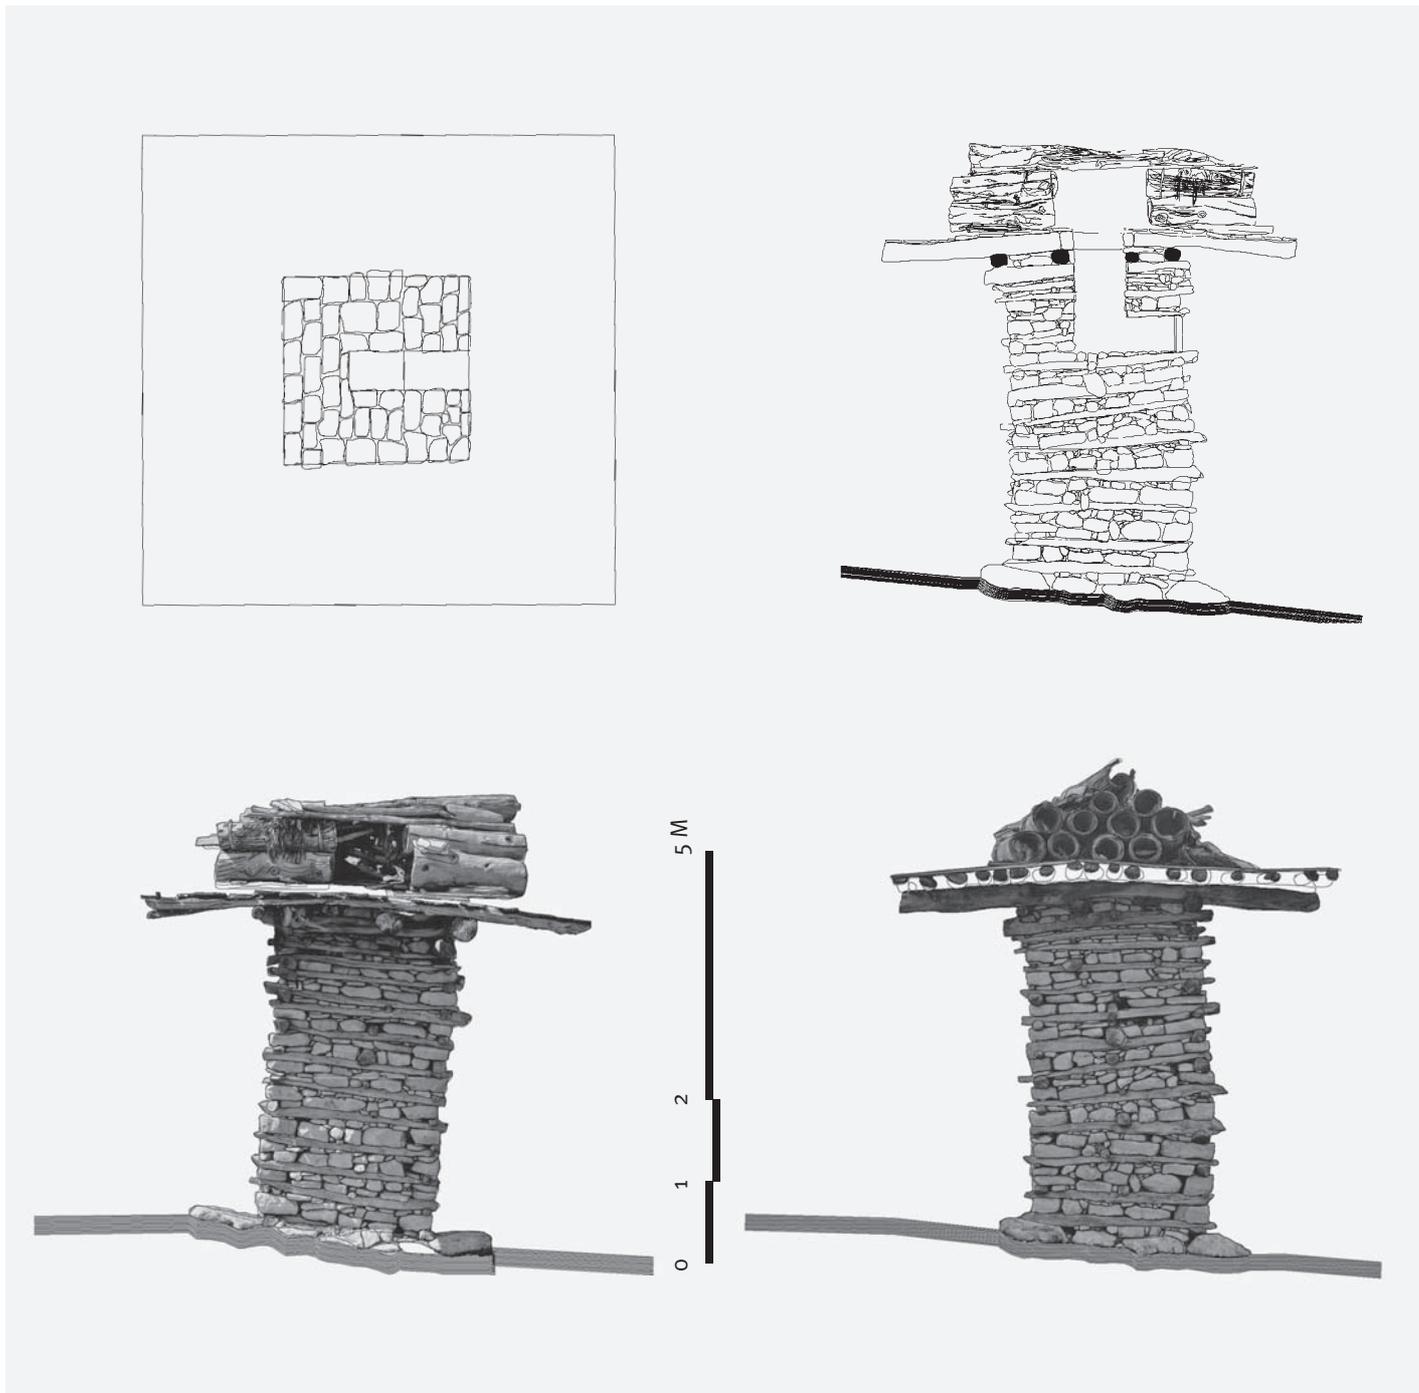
THE FORMATION OF BEE YARDS (ARI SERENLERI): PLAN, SECTION AND ELEVATIONS
